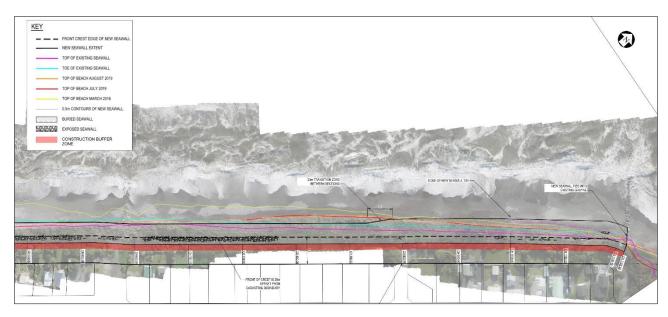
Draft design for proposed seawall extension (Tudor Street to Richards Drive) with added construction buffer zone (Image Source: Beca Design Documents, 23 December 20201)
